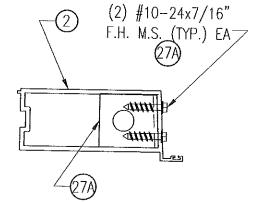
TOP/BOTTOM RAIL CONNECTION TO STILES
